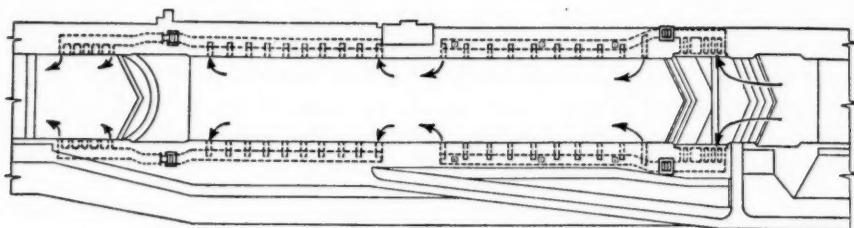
Lock No. 41, OHIO RIVER (LOUISVILLE, KY.)
